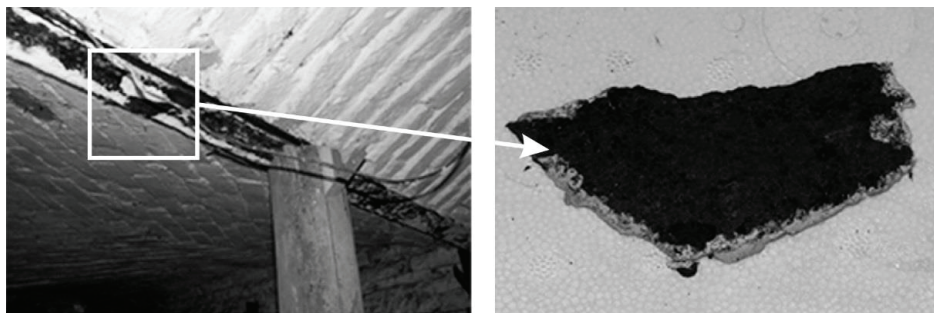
View of a highly corroded steel beam in the ceiling above the basement.
